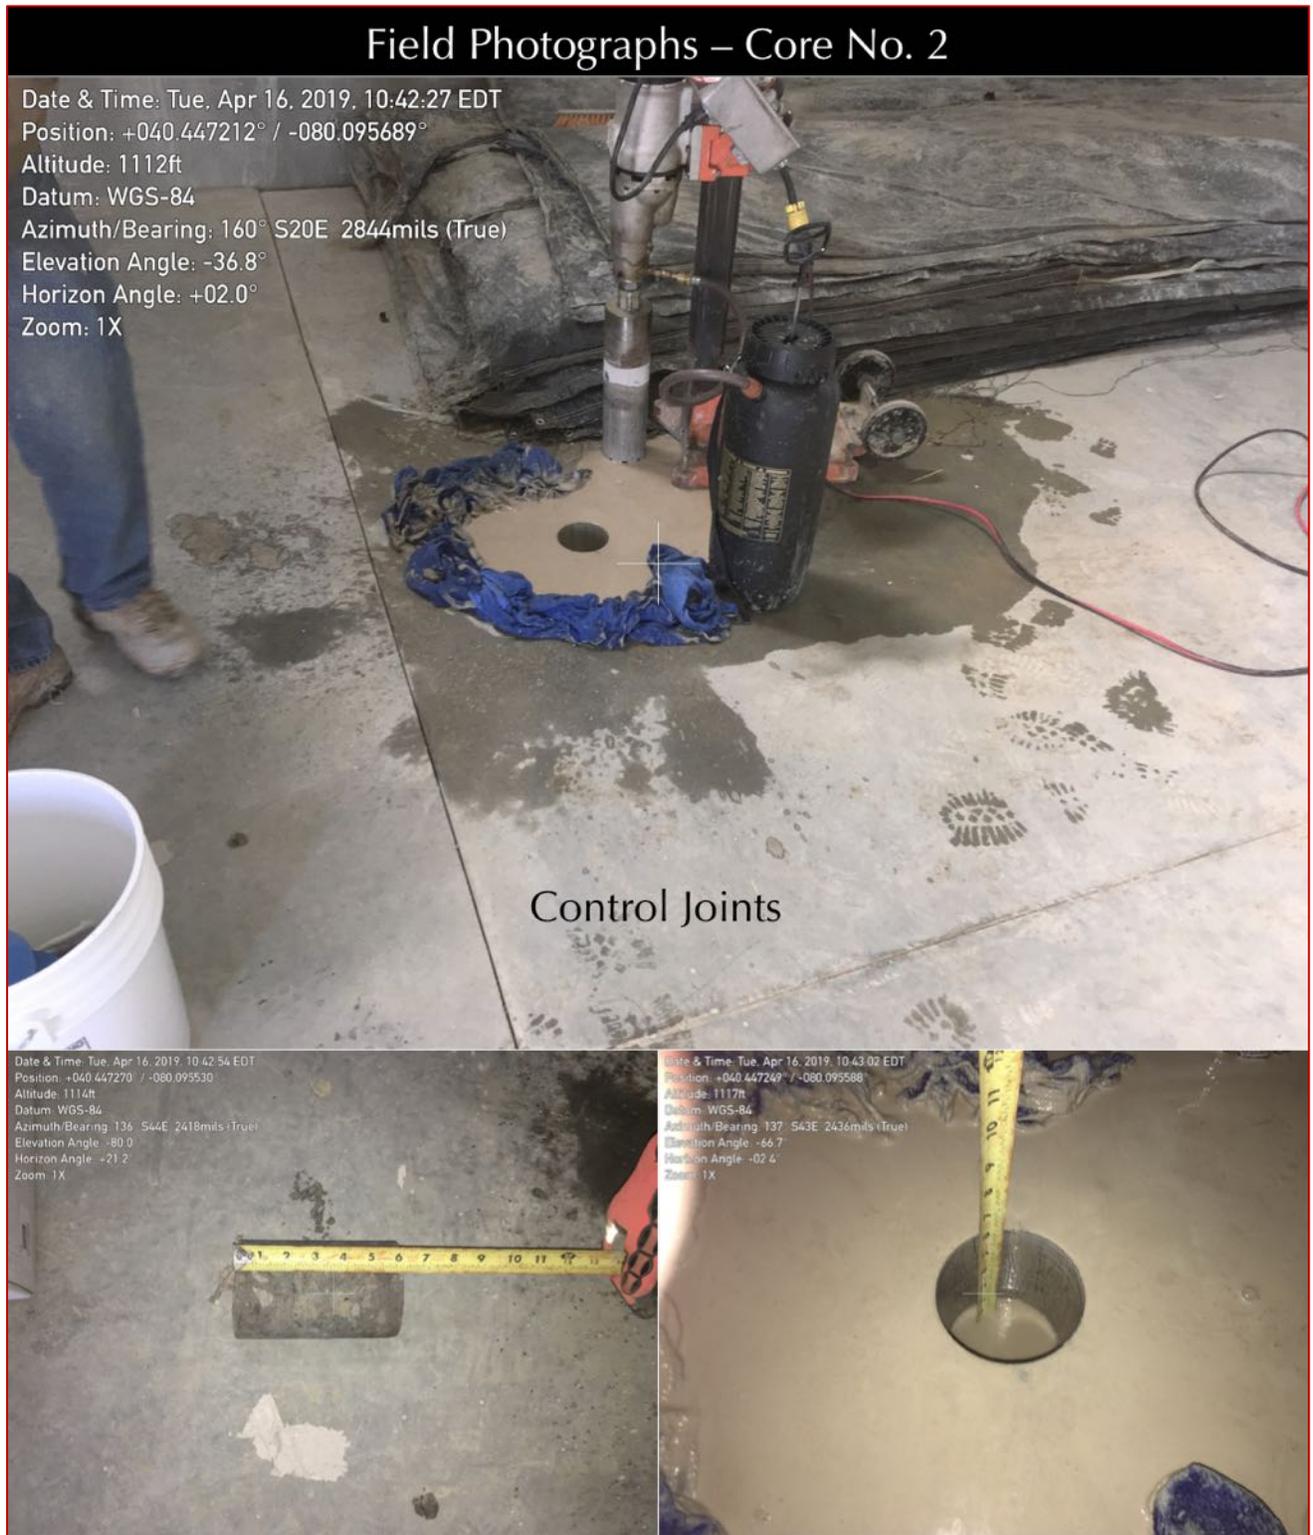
Field photographs showing retrieval of Core 2 from an area where slab showed no visible surface cracking, and a smooth, flat, dense, hard trowel-finished surface. Core 2 is 6 in. in nominal length, drilled through full-depth of the slab.
